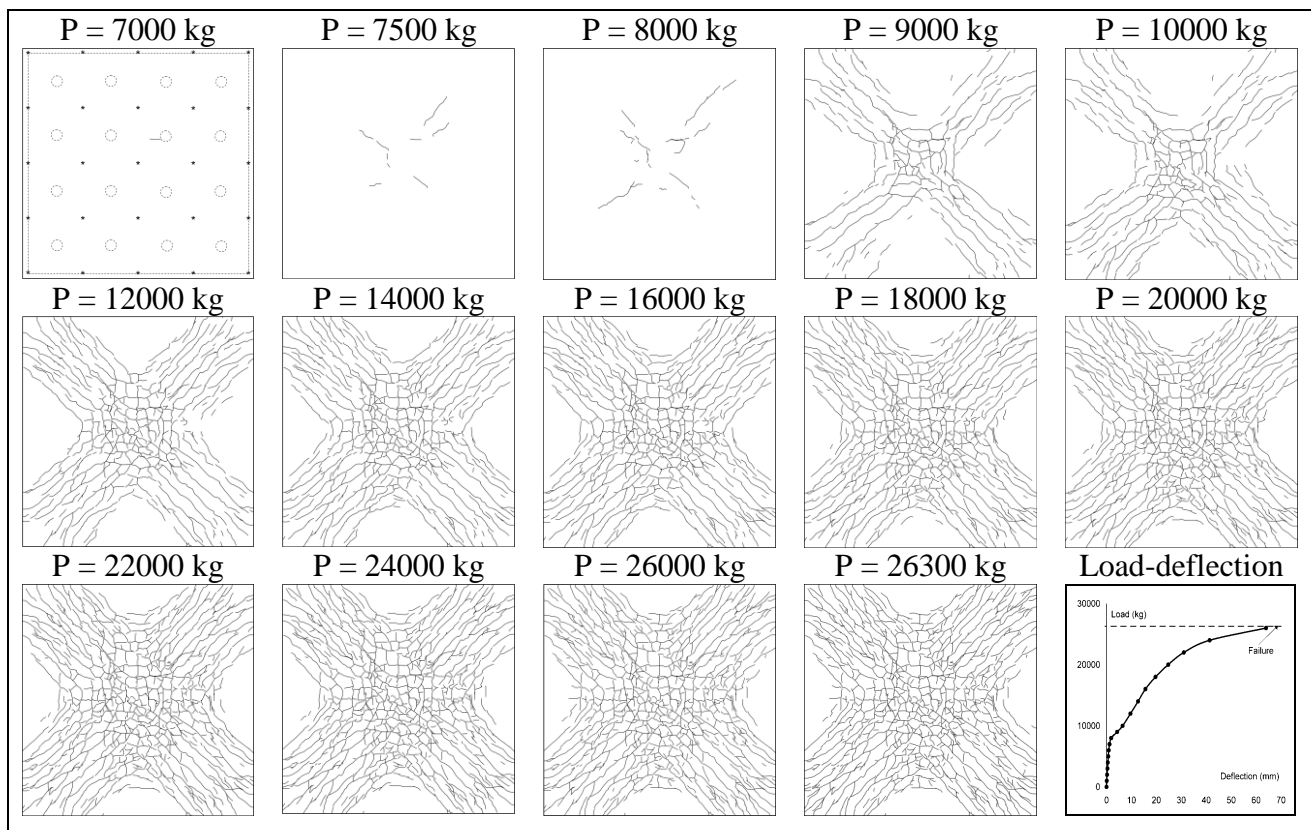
[Development of cracks in concrete slab at increased load level](#) [6.5].
